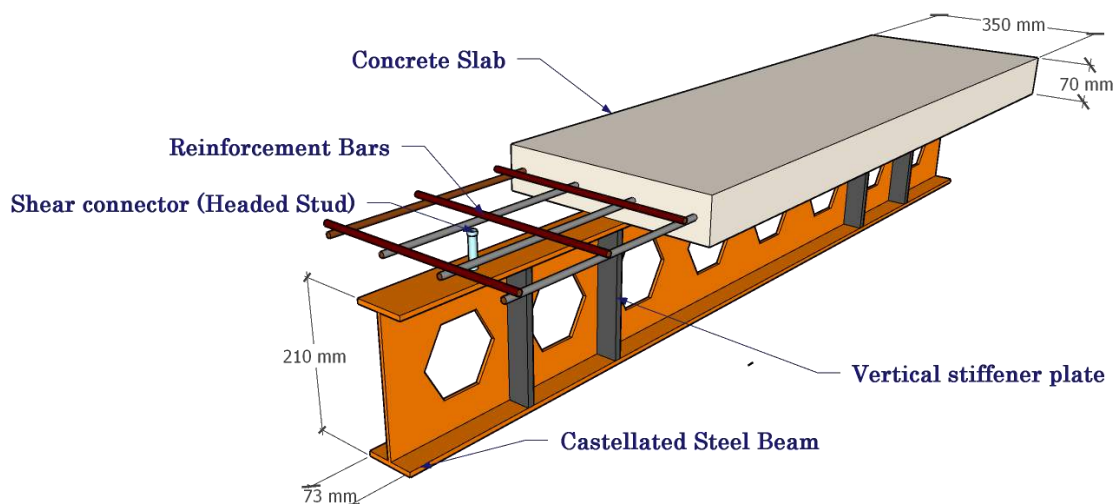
Composite Castellated Steel-Concrete Sample CB-H4R2.
